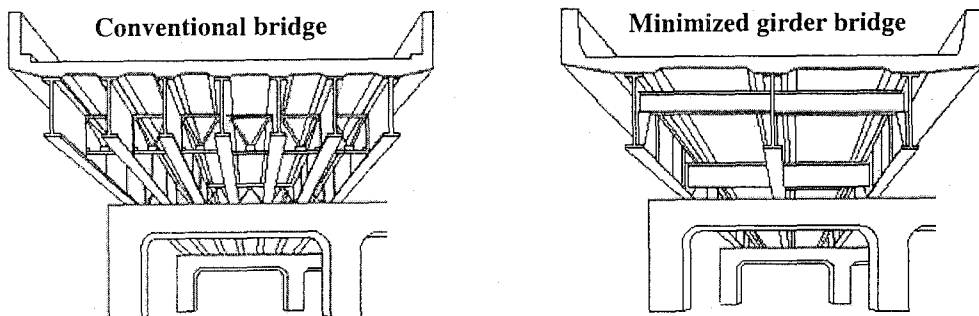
Conceptual Graphs of a Conventional Bridge and a Minimized Girder Bridge
